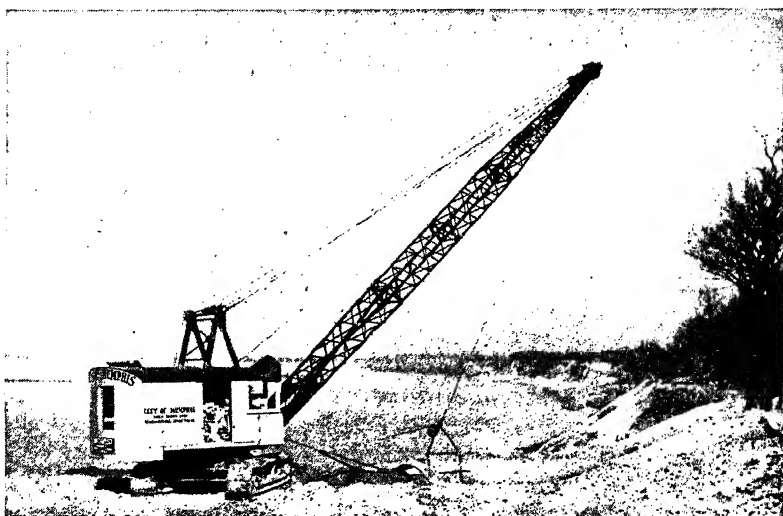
Dragline in moderate depth excavation. (Courtesy of Northwest Engineering Company.)
